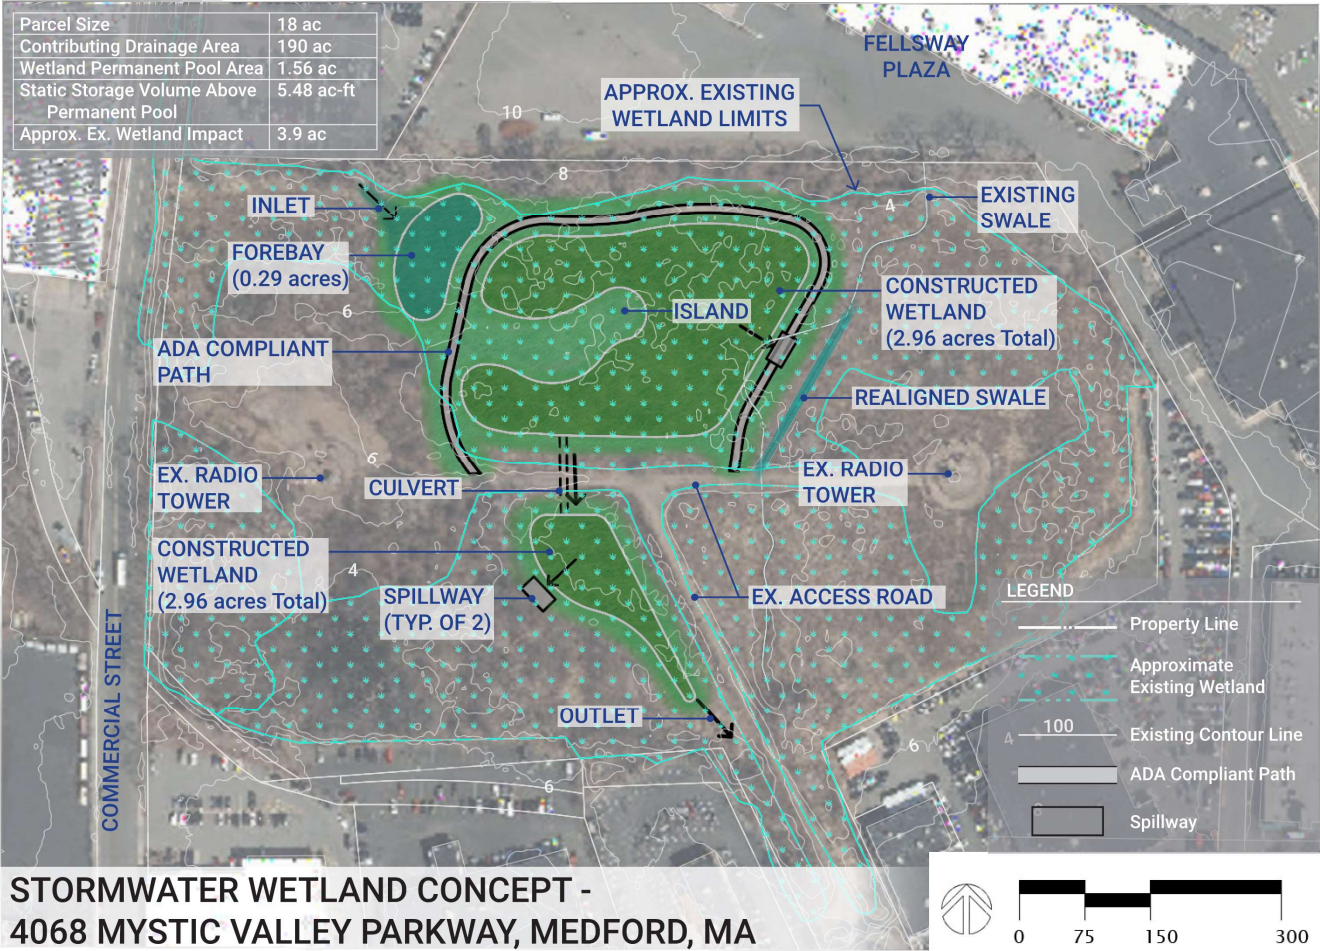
Conceptual Design Layout for Mystic Valley Parkway Site (Medford)
